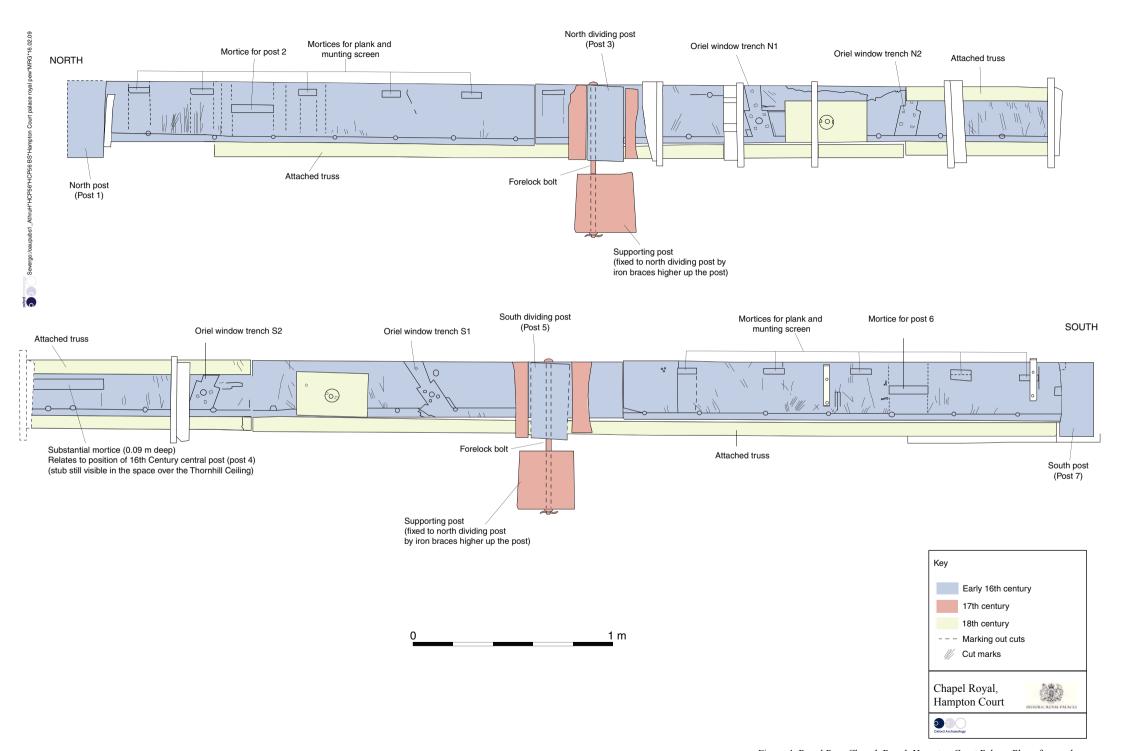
Royal Pew, Chapel, Royal, Hampton Court Palace. Plan of upper beam
